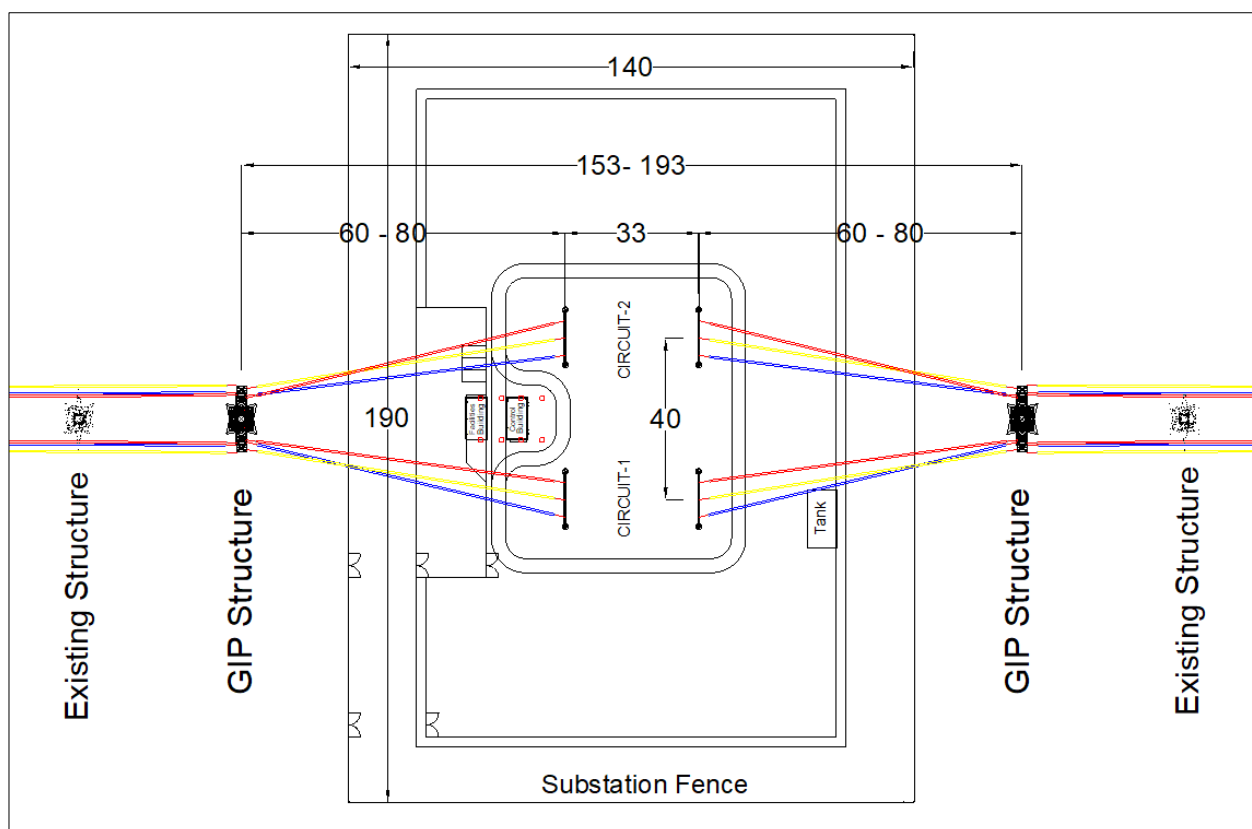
GIP General Plan Layout with 2DD-HST Tower
